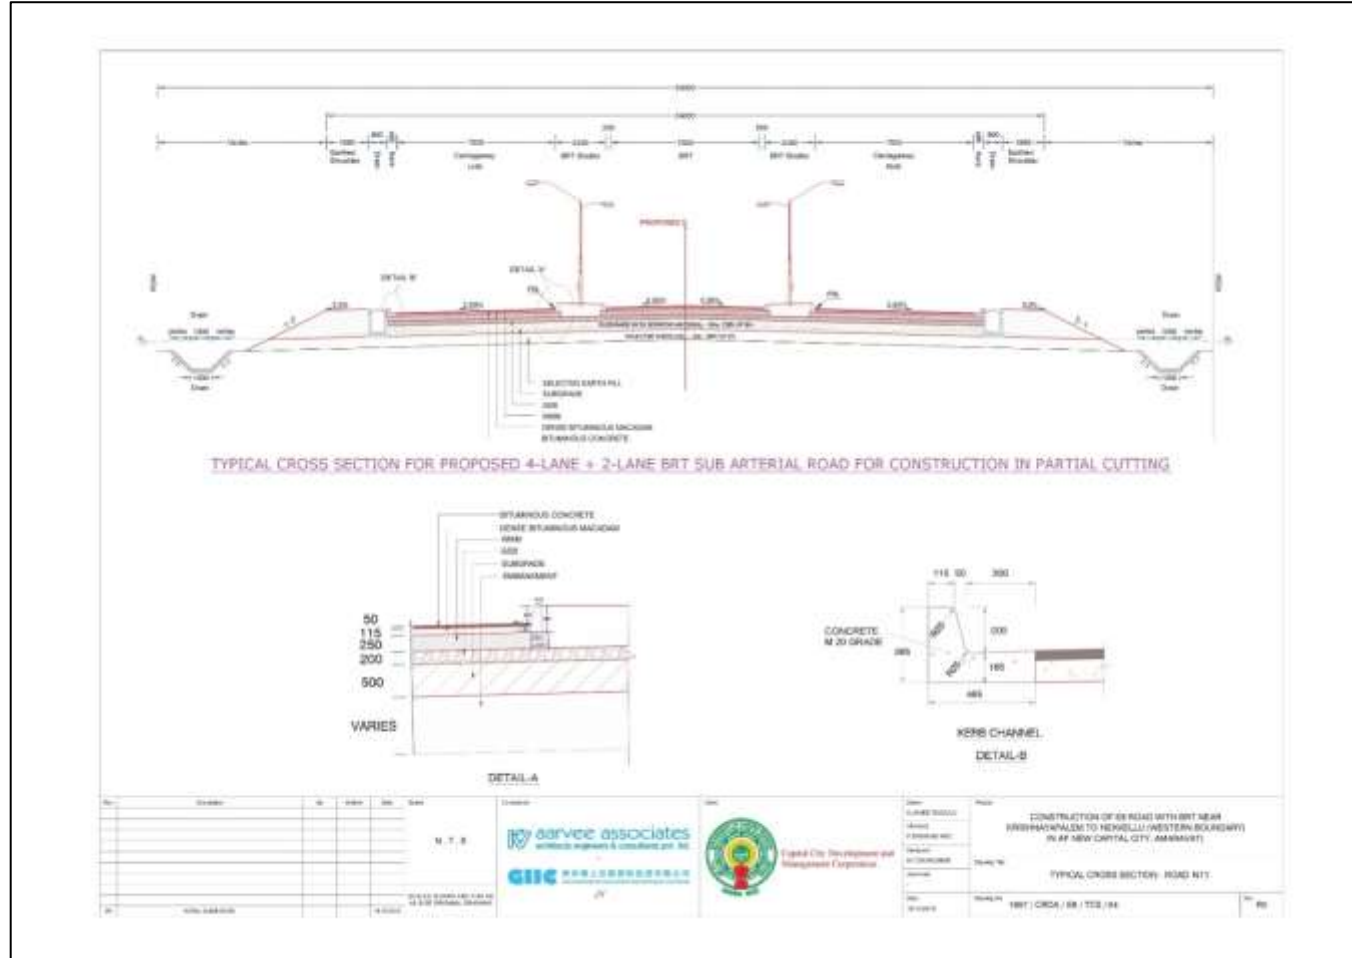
TCS for proposed 4-Lane + 2-Lane BRT Sub-arterial road for construction in Partial Cutting
